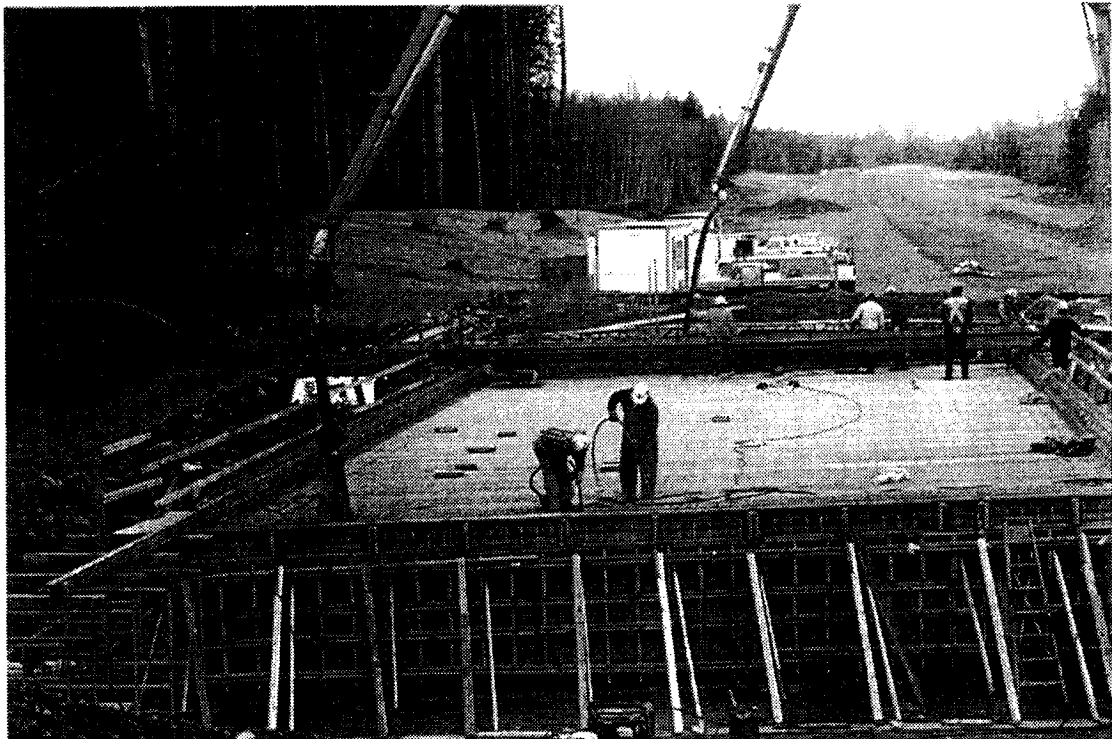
Construction of Waterloo Creek Bridge [Tsai and Ventura, 1998]
